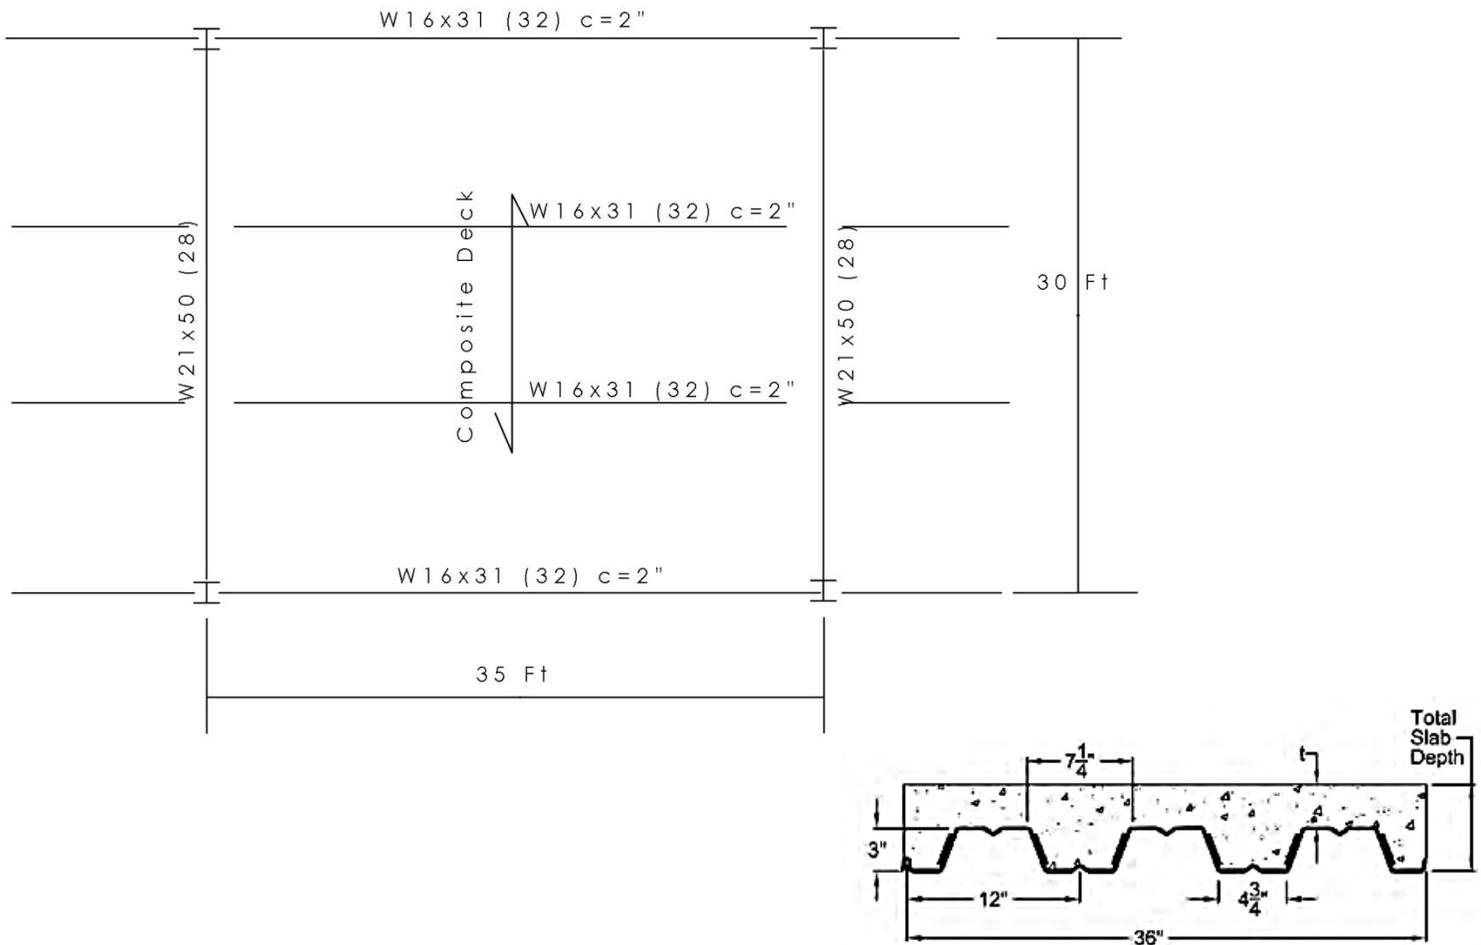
Composite Steel System Layout (top left) and composite deck section taken from Vulcraft 2008 catalog (lower right)
